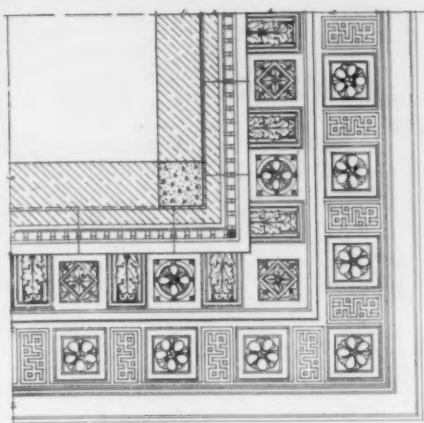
DETAILS OF WM. MOORE DRY GOODS COMPANY BUILDING,
